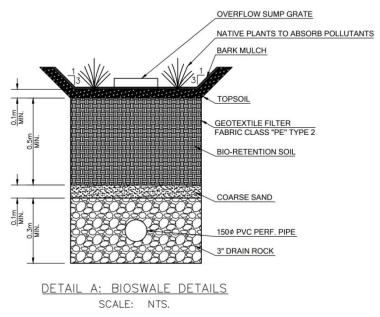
Infiltration Soil with Reservoir and Subdrain Cross Section
